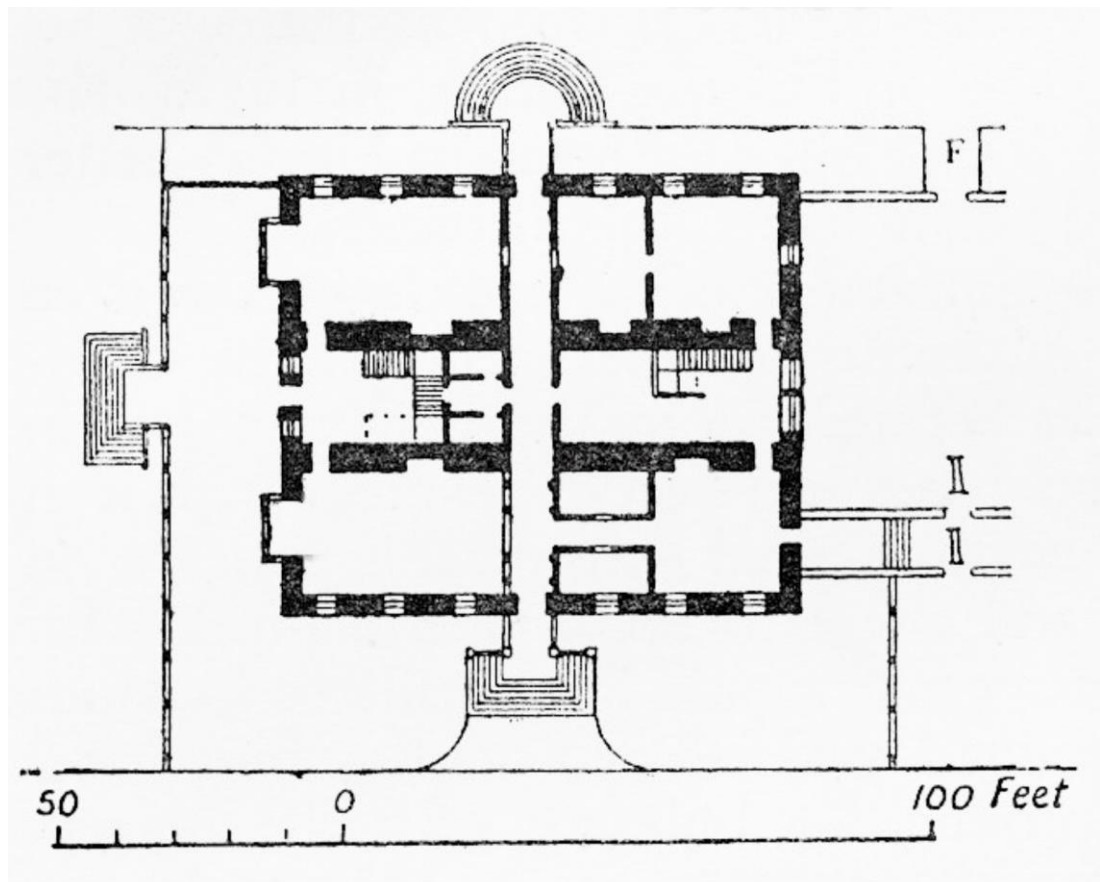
Plan of Thorpe Hall, a mid-17th century mansion house in Cambridgeshire, showing layout of rooms. Image by courtesy of britishtowns.net.
